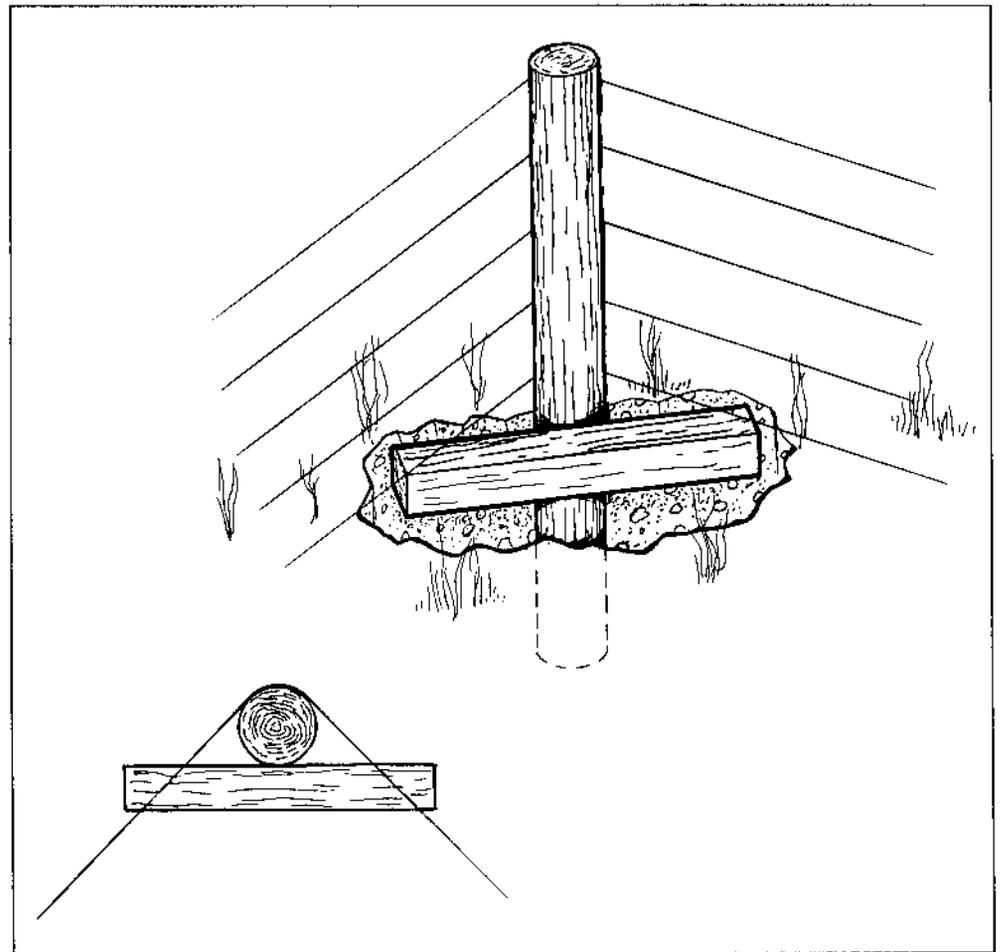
Block fence brace used at a dog leg or 90-degree corner.
